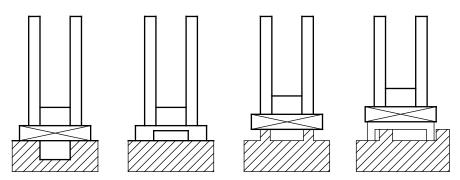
Examples of glazing blocks that do not obstruct the drainage
